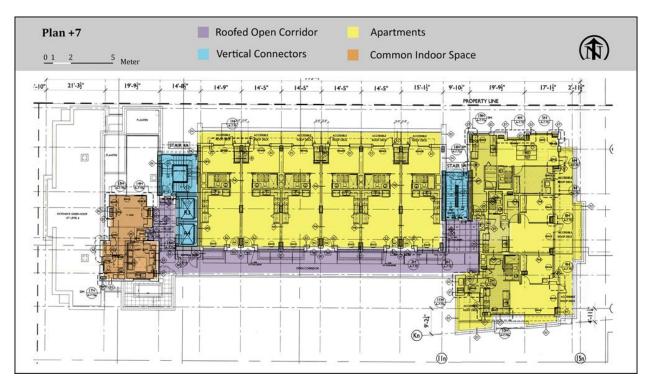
7th Floor Plan The arrangement of the open corridor and other areas
